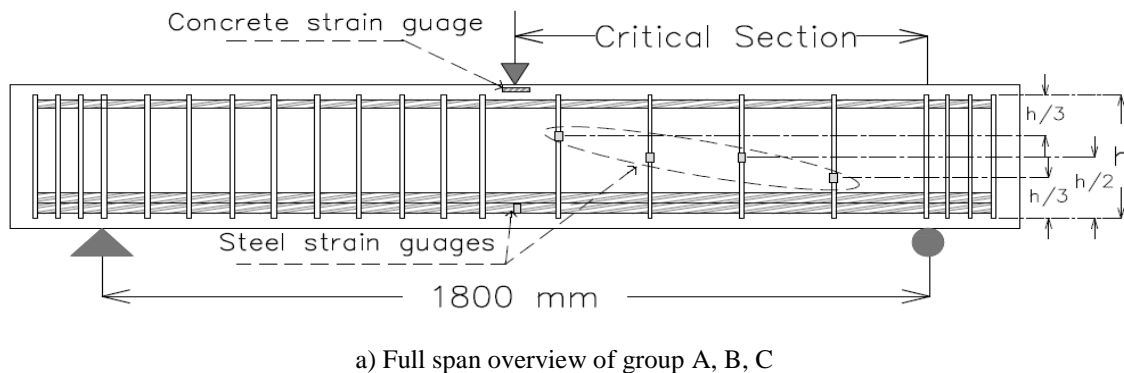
Locations of strain gauges on steel reinforcement and concrete surface
